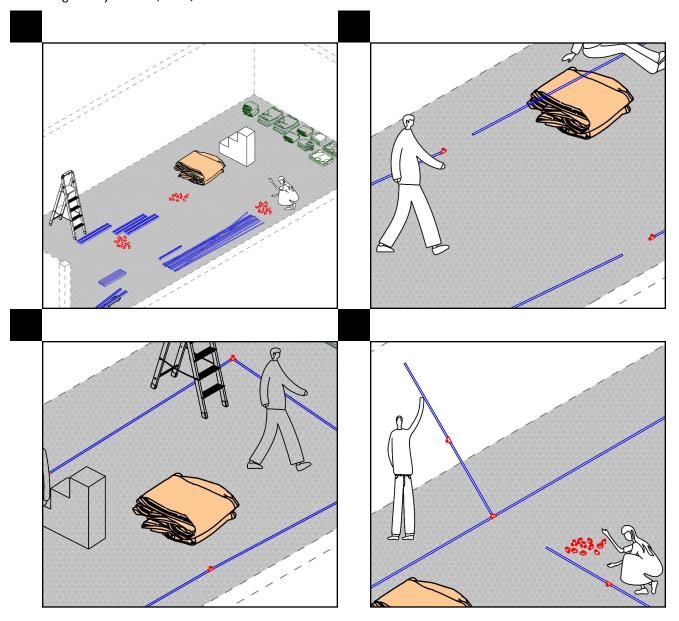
Construction 3: Initial Construction Process Connecting a Perimetre for External Shell. Diagram by Author (2024).
